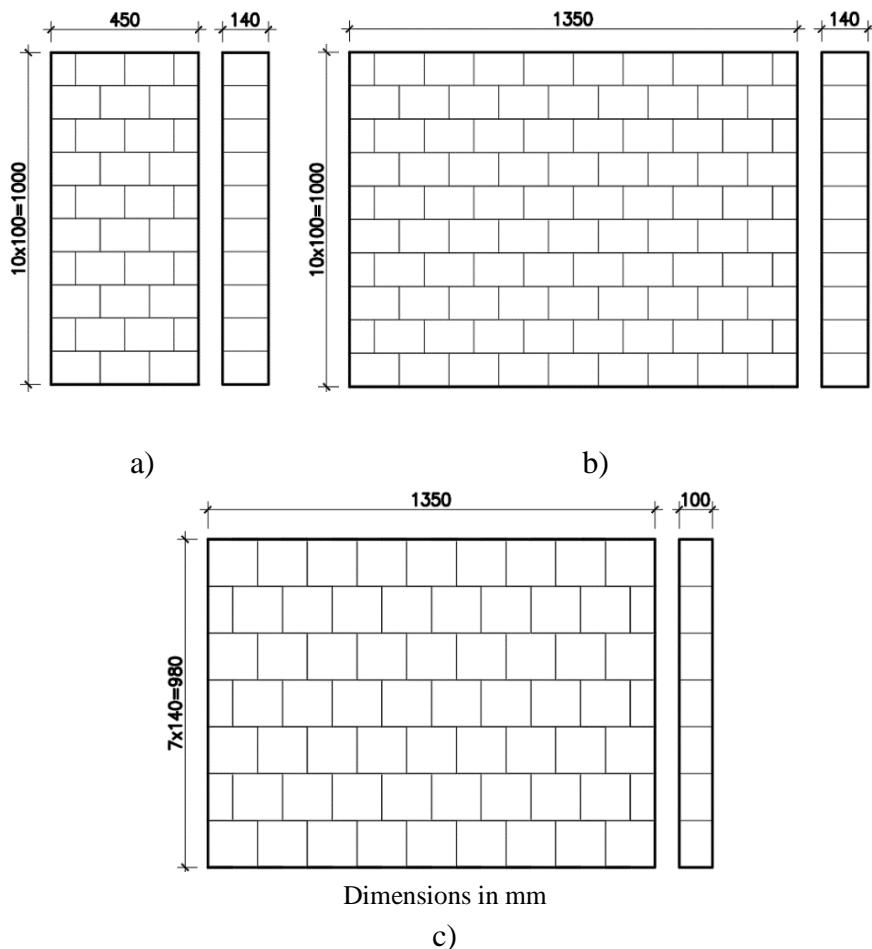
Uniaxial specimen dimensions: a) Test series S01.AT.LBC; b) Test series S02.AT.CIC, S03.HT.LL8 and S04.HT.RTE; c) Test series S05.HT.LL10
